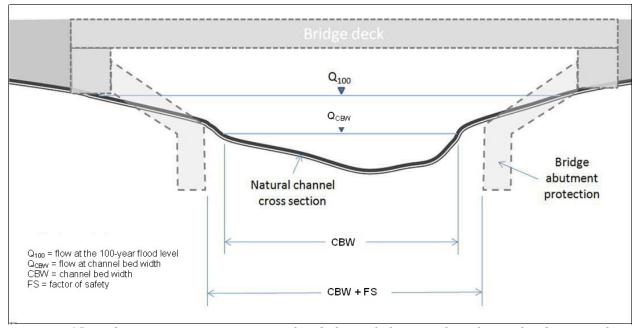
Bridge cross section over a confined channel showing the relationship between the channel bed width and the recommended width between abutment protections.
